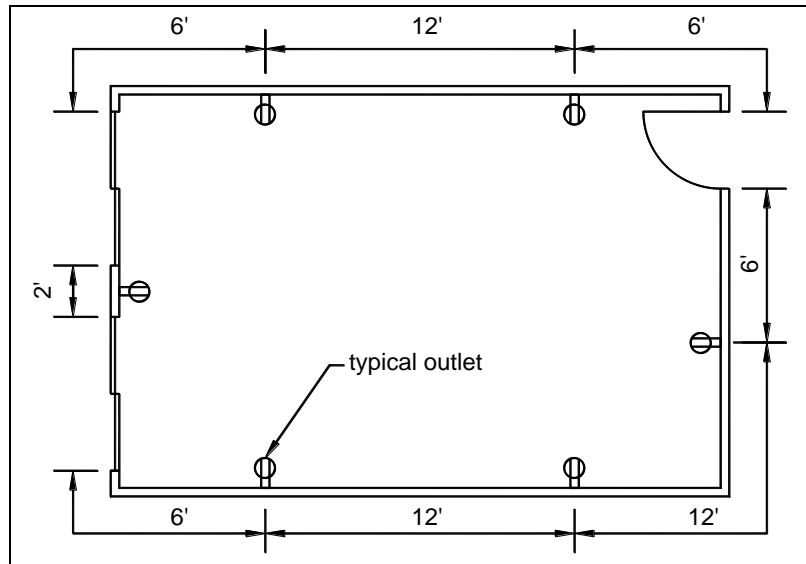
TYPICAL OUTLET DISTRIBUTION
